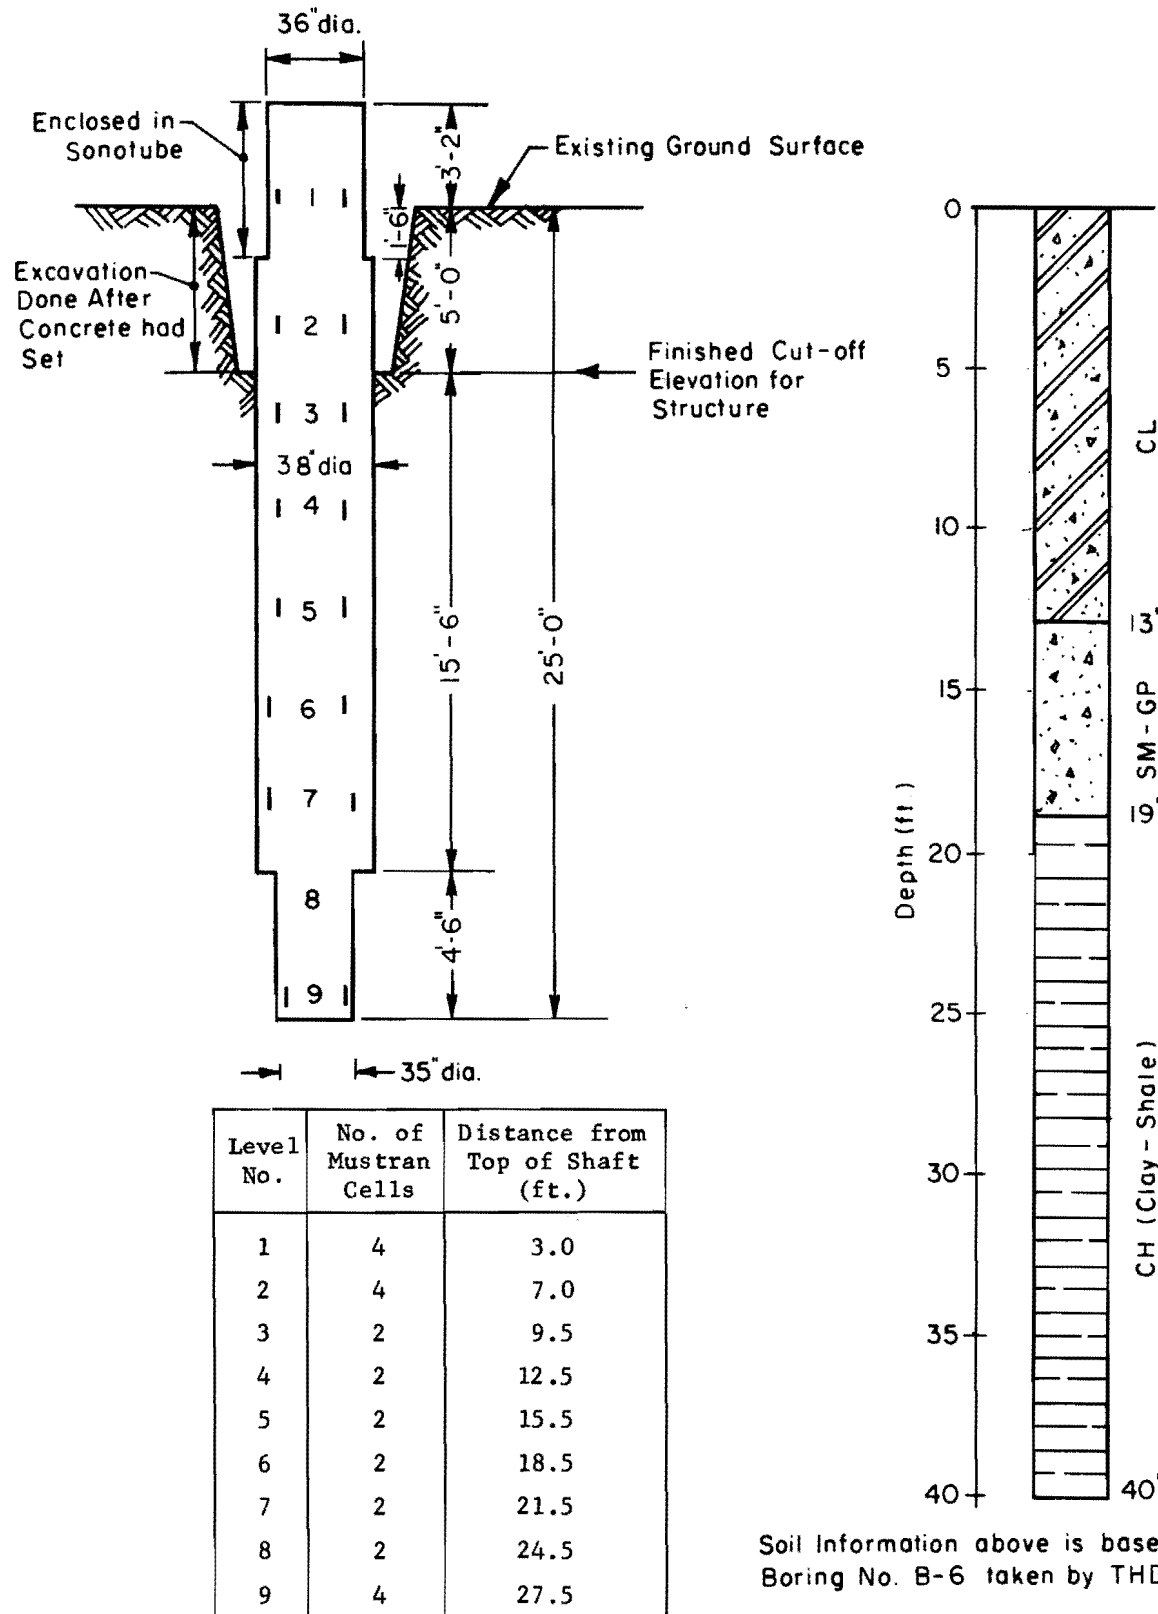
Soil profile and instrumentation at shaft DT1 built by Casing Method.
